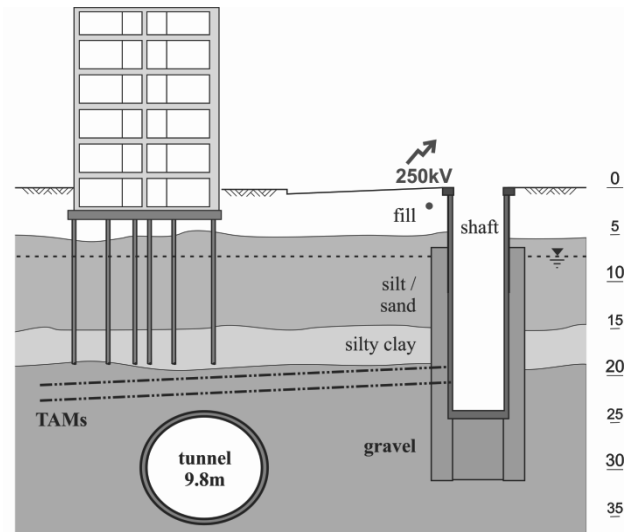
Schematic cross section of piled foundation at 'Ionio Station'.
